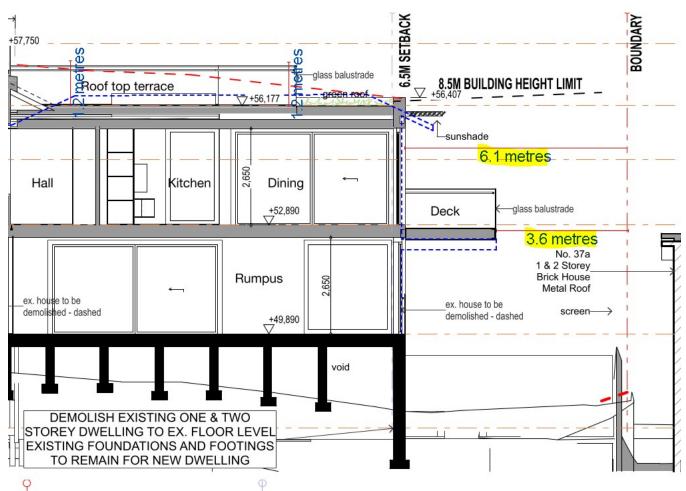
Extract of plans showing setbacks to northern (rear) boundary.
